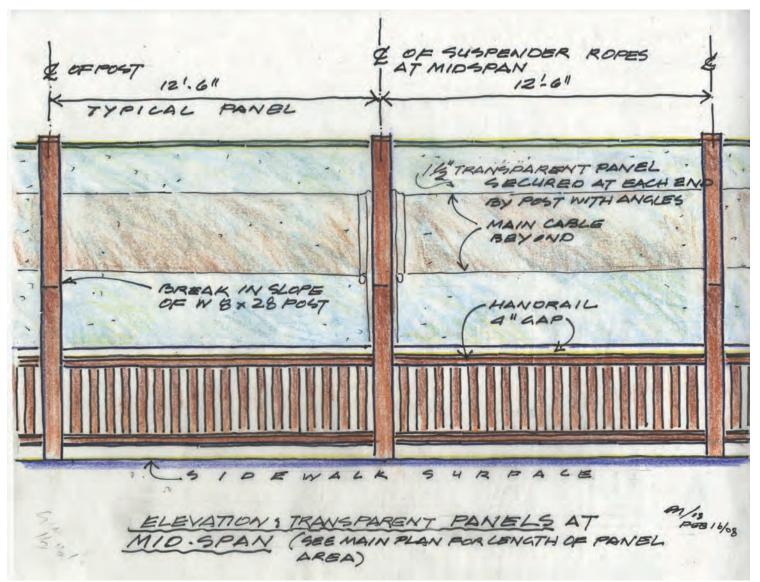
ELEVATION OF TRANSPARENT PANELS AT MID-SPAN
